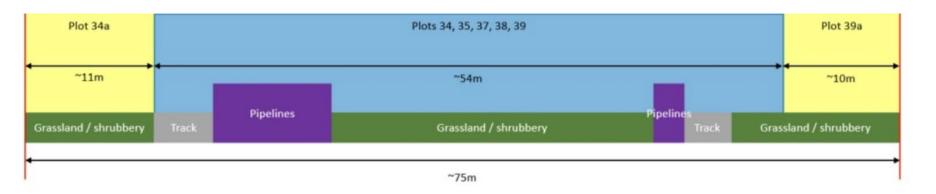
Indicative Cable Trenching Arrangement and Working Area
